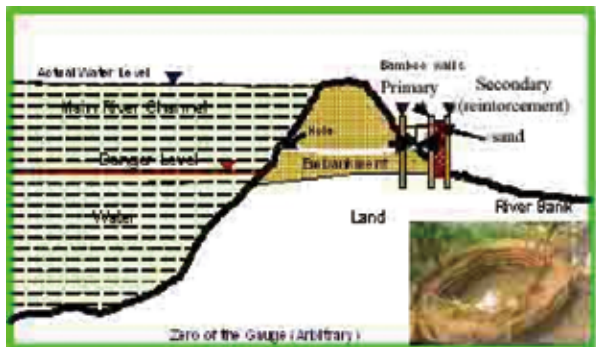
Cross Section of dyke and Yaing Khway, or “small well”
